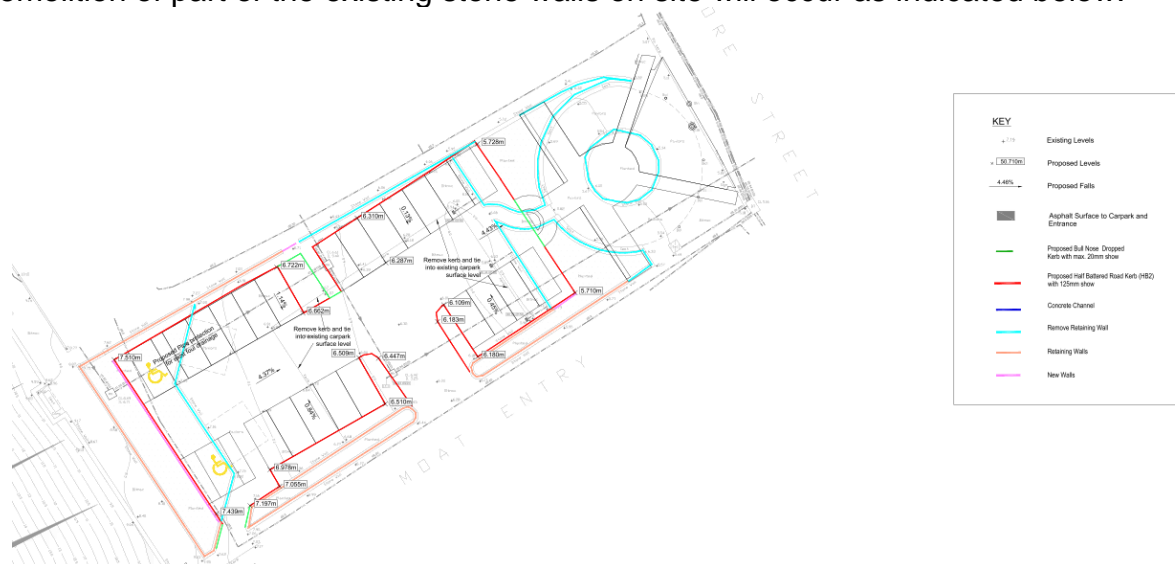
Proposed site layout – walls to be demolished marked in turquoise
